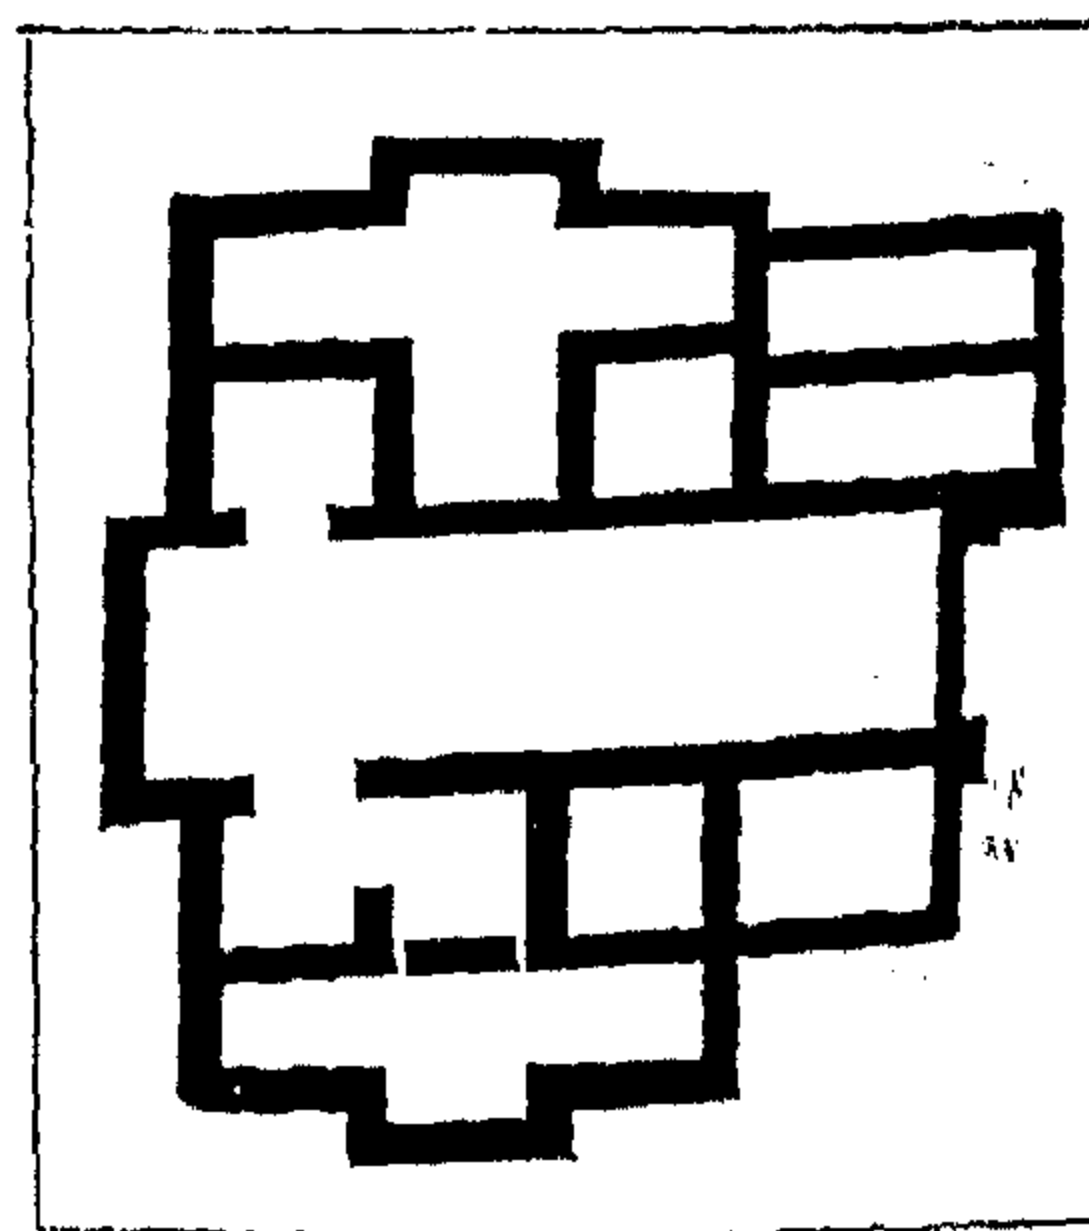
Plan of House in level II at Tell Abadeh (after Jasim 1979, Fig. 2).
